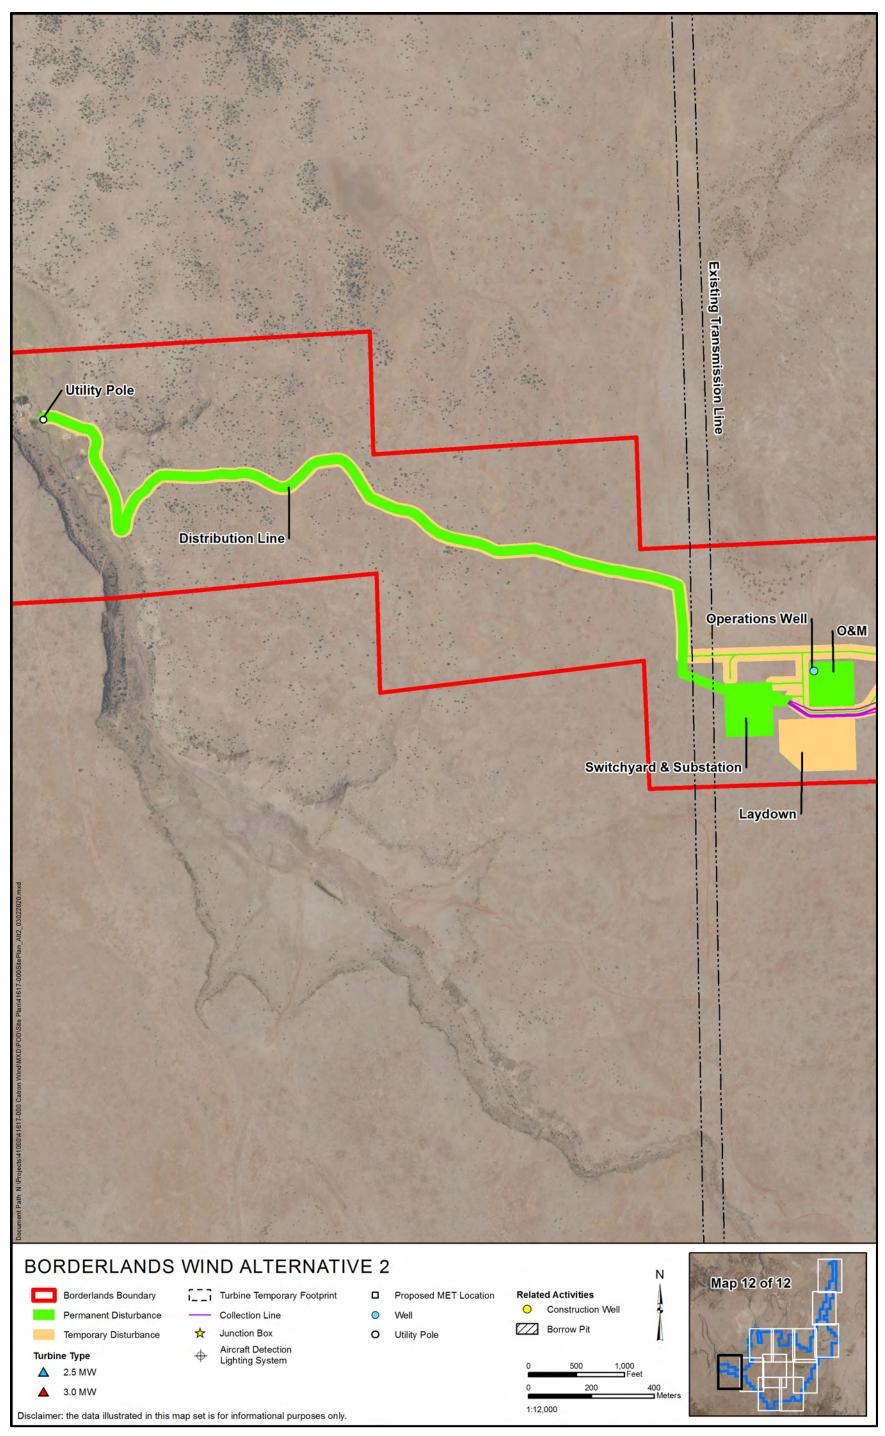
I. Alternative 2 Site Plan (Map 12 of 12)
